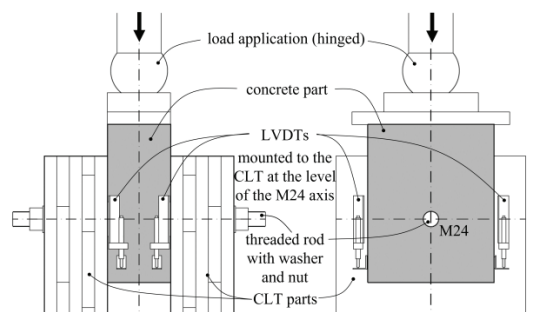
Illustration of the experimental push-out test set-up for the CLT-to-concrete connection.
